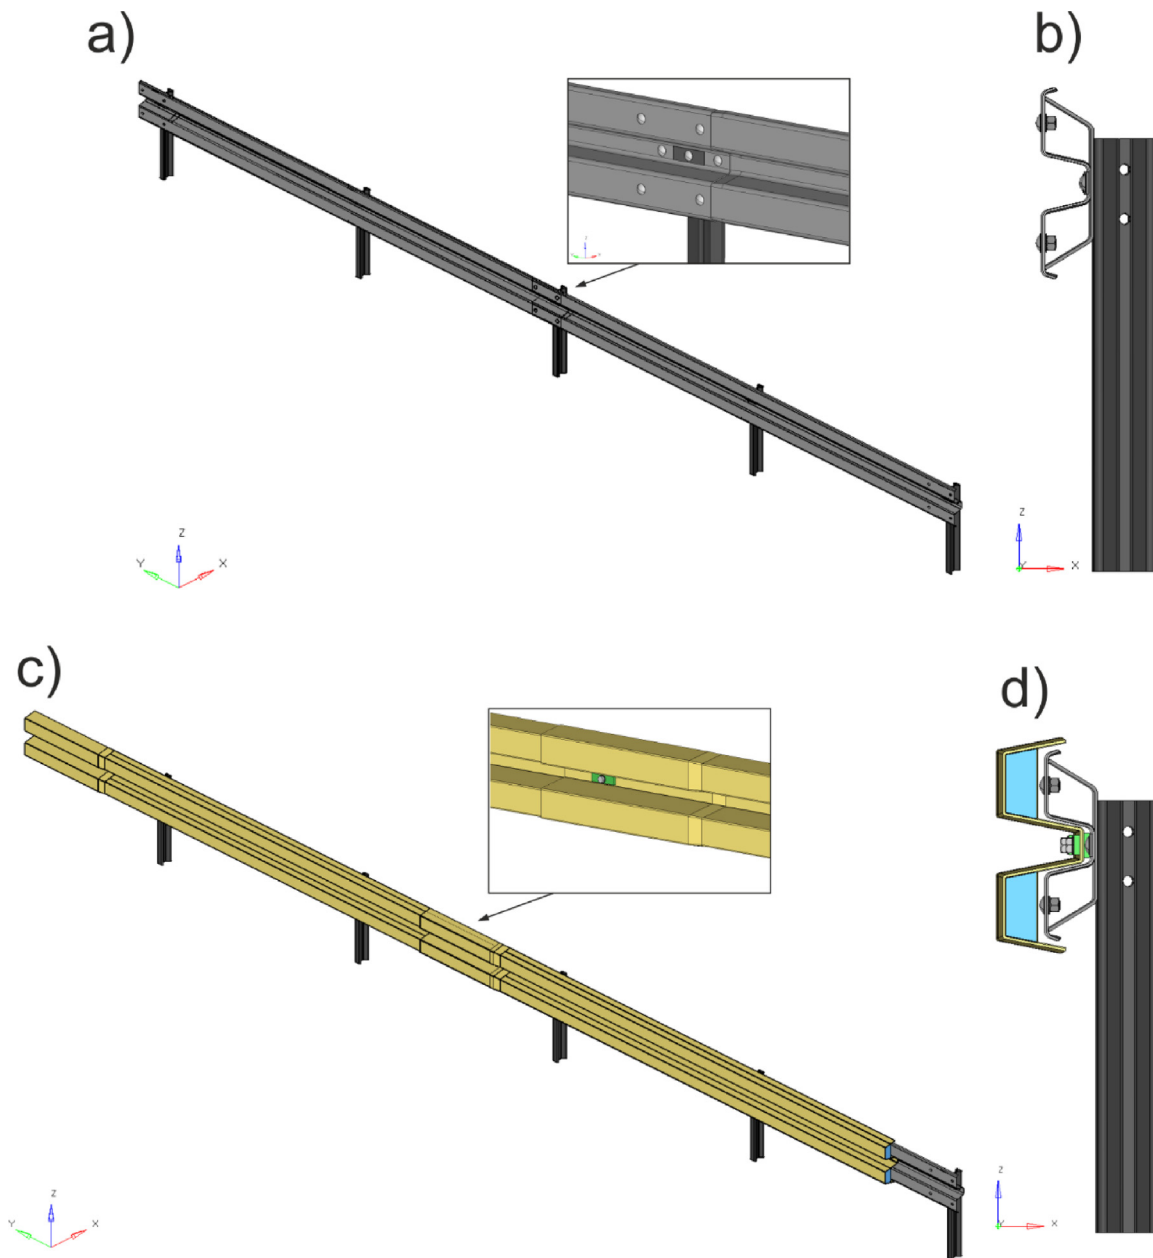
Geometrical models of barrier SP-05/2 without and with overlay: (a) two segments of SP-05/2 barrier in isometric view; (b) cross section of SP-05/2 barrier; (c) two segments of CFR2 overlay in isometric view; (d) cross section of SP-05/2 barrier with CFR2 overlay.
